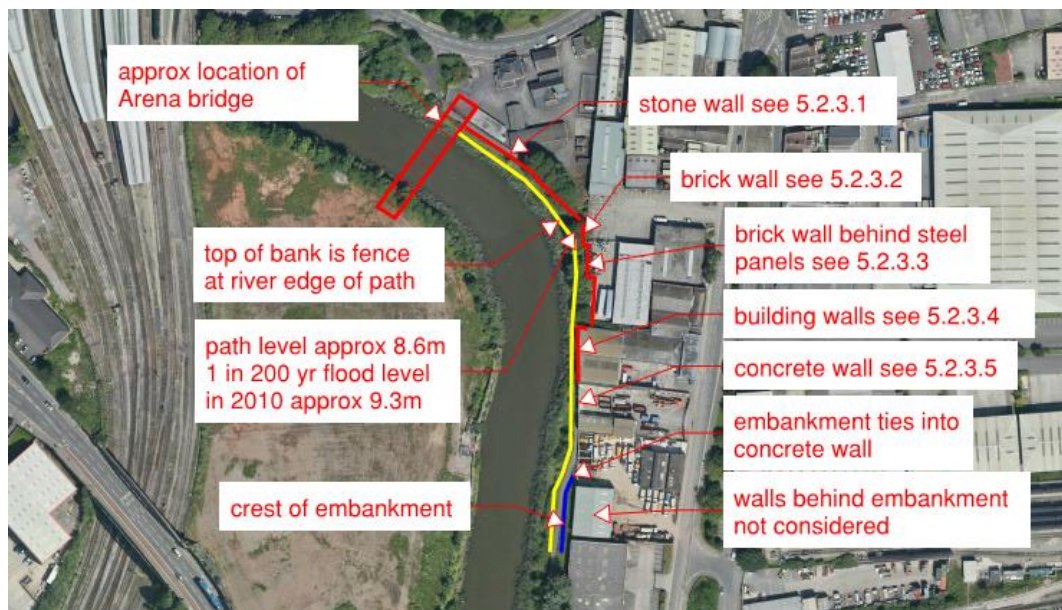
Walls from Cattle Market Road to Bristol Electric Centre, aerial image © Blom 2012
